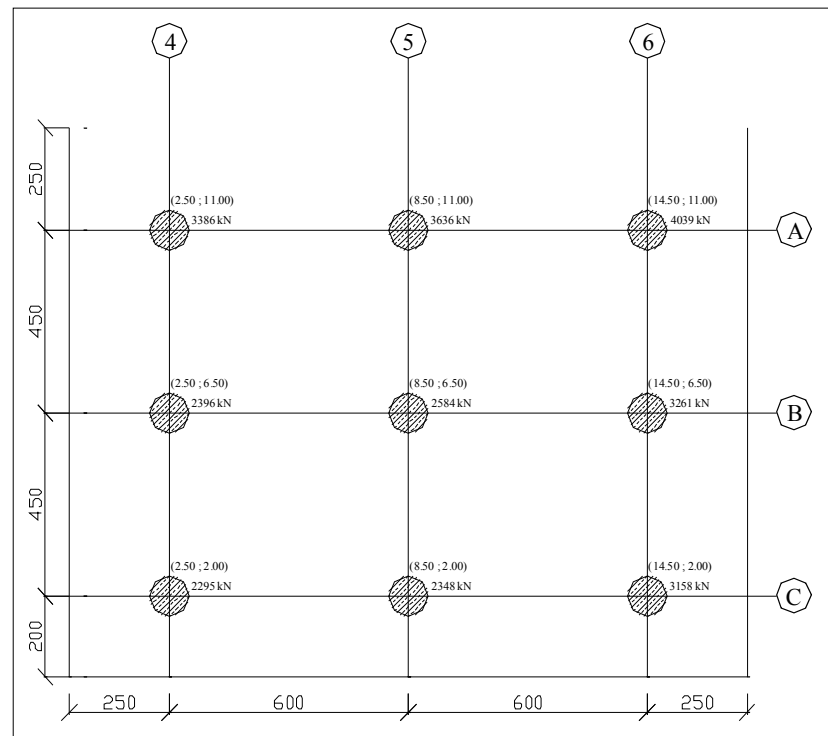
Pile disposition plan and pile loads (9 piles with 25m length) for the improved soil profile
